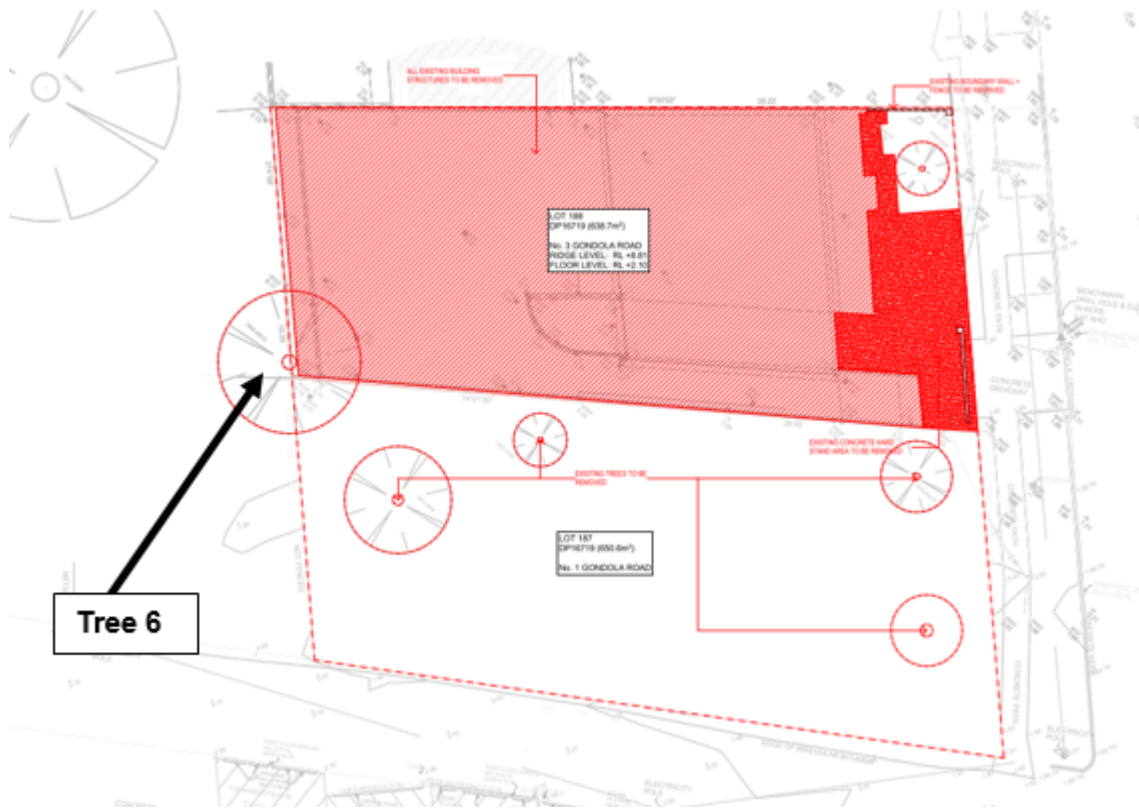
Demolition plan depicting Tree 6 on the Subject Site and 4 Rickard Road
